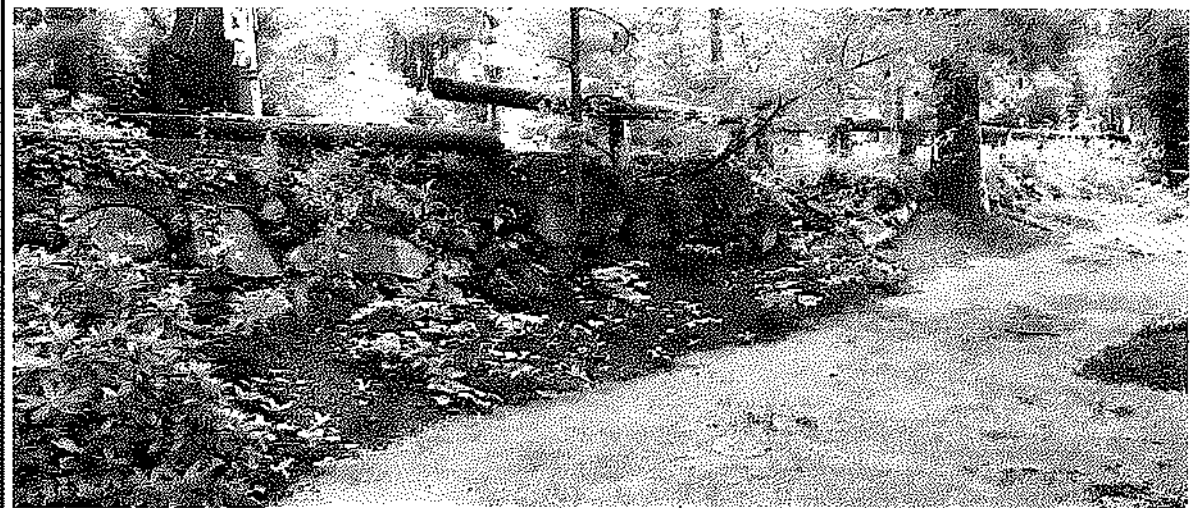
Photo taken July 19, 2021 of downstream wall western portion looking south, showing bulging wall, large trees in wall, and voids between stones.
